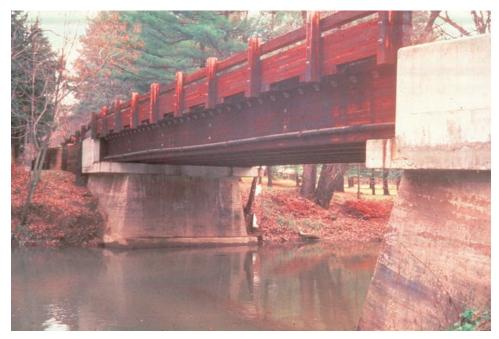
Elevation View of a Glulam Multi-beam Bridge
